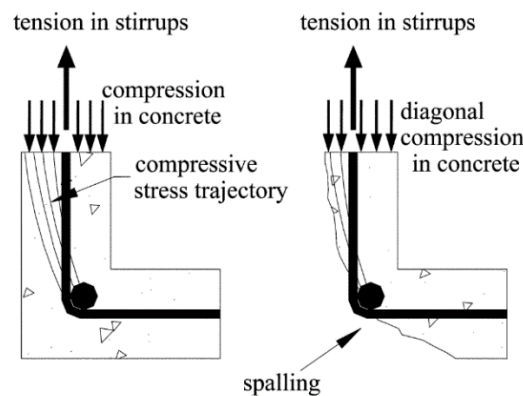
2006, K. Rahal, Spalling of concrete cover in beams subjected to shear.
